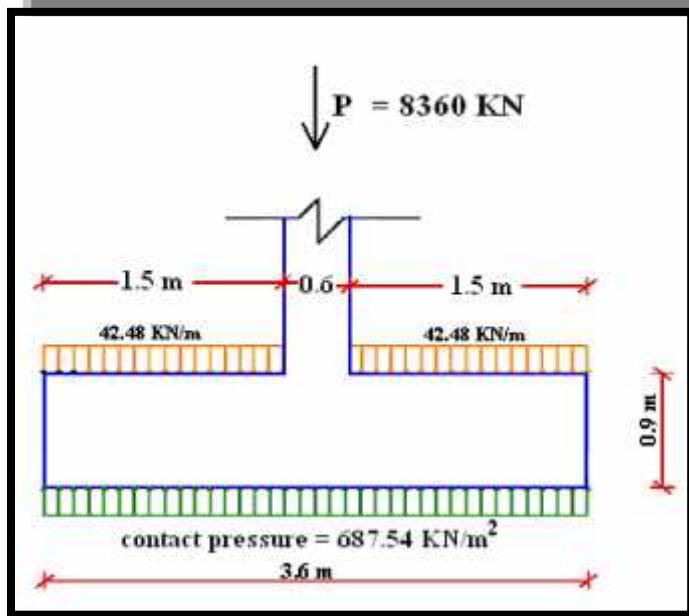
Structural system of Isolating Footing (Section 2-2)
